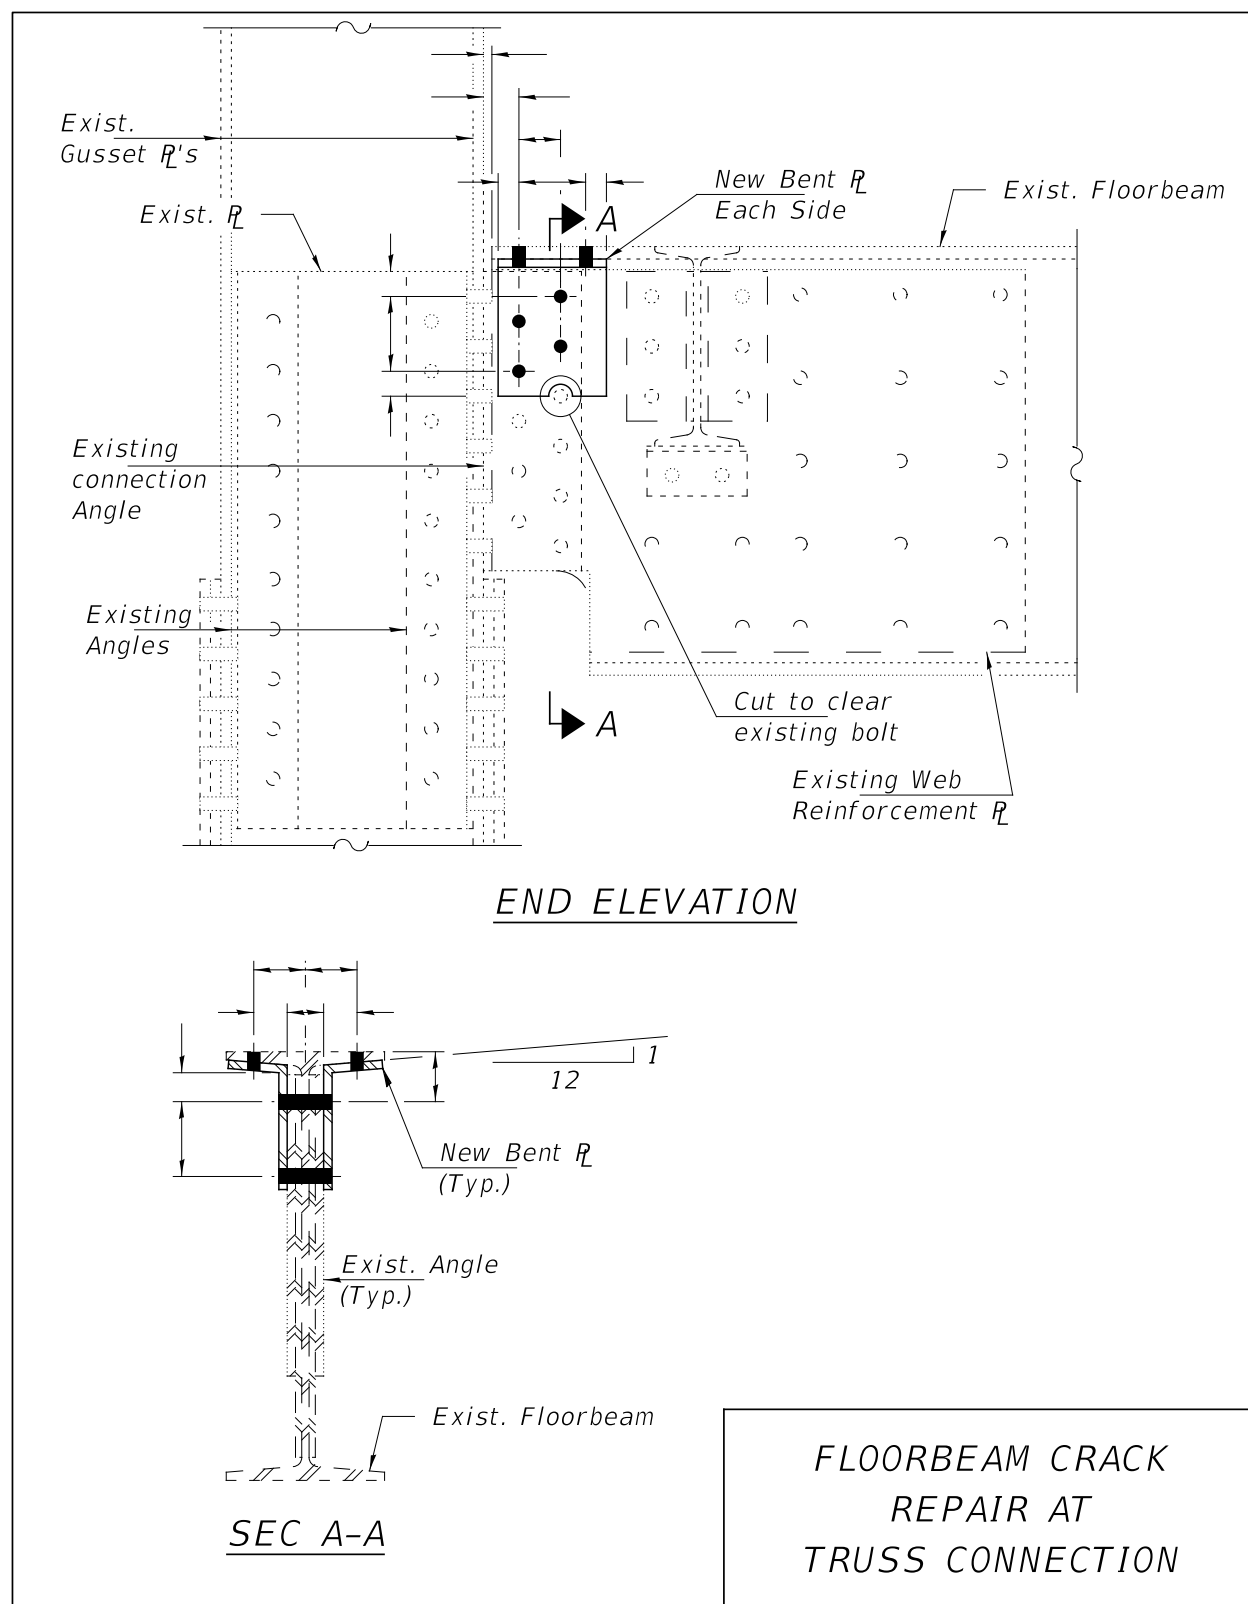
Floorbeam Crack Repair at Truss Connection
